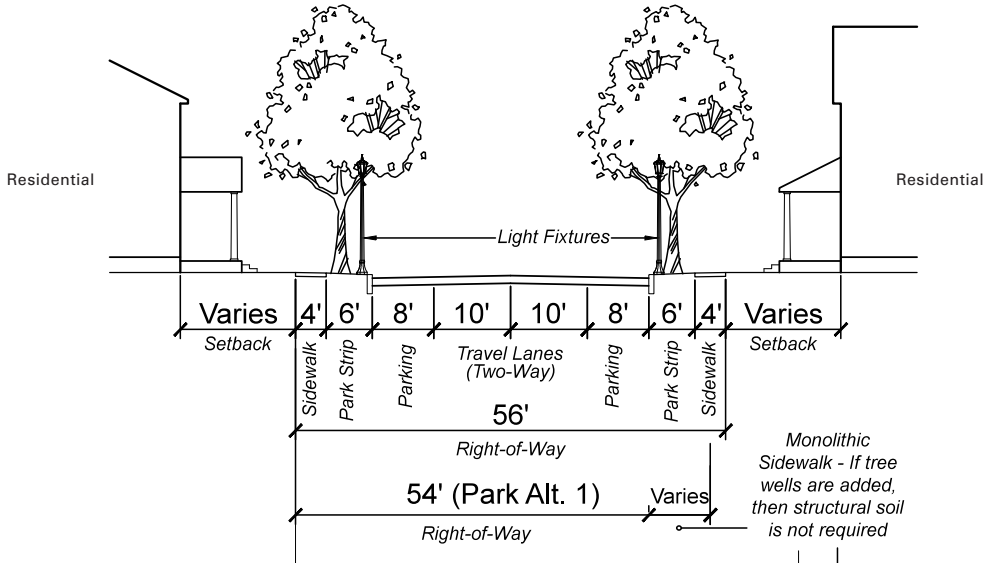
Proposed Section and Plan: Neighborhood Street A
